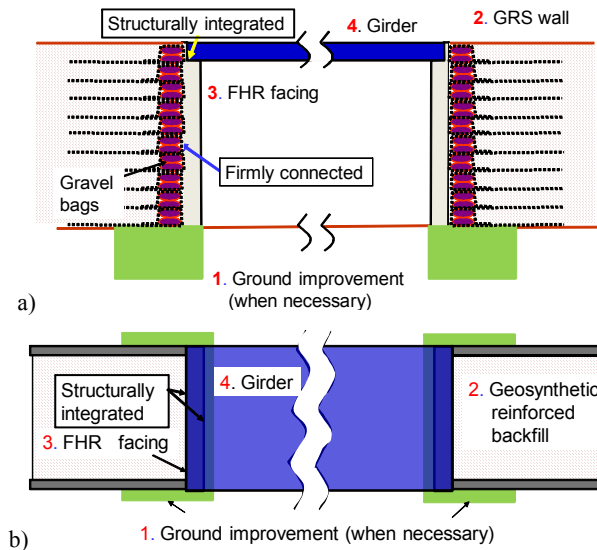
Structure of GRS integral bridge (the numbers denote the construction steps): a) elevation; and b) plan
